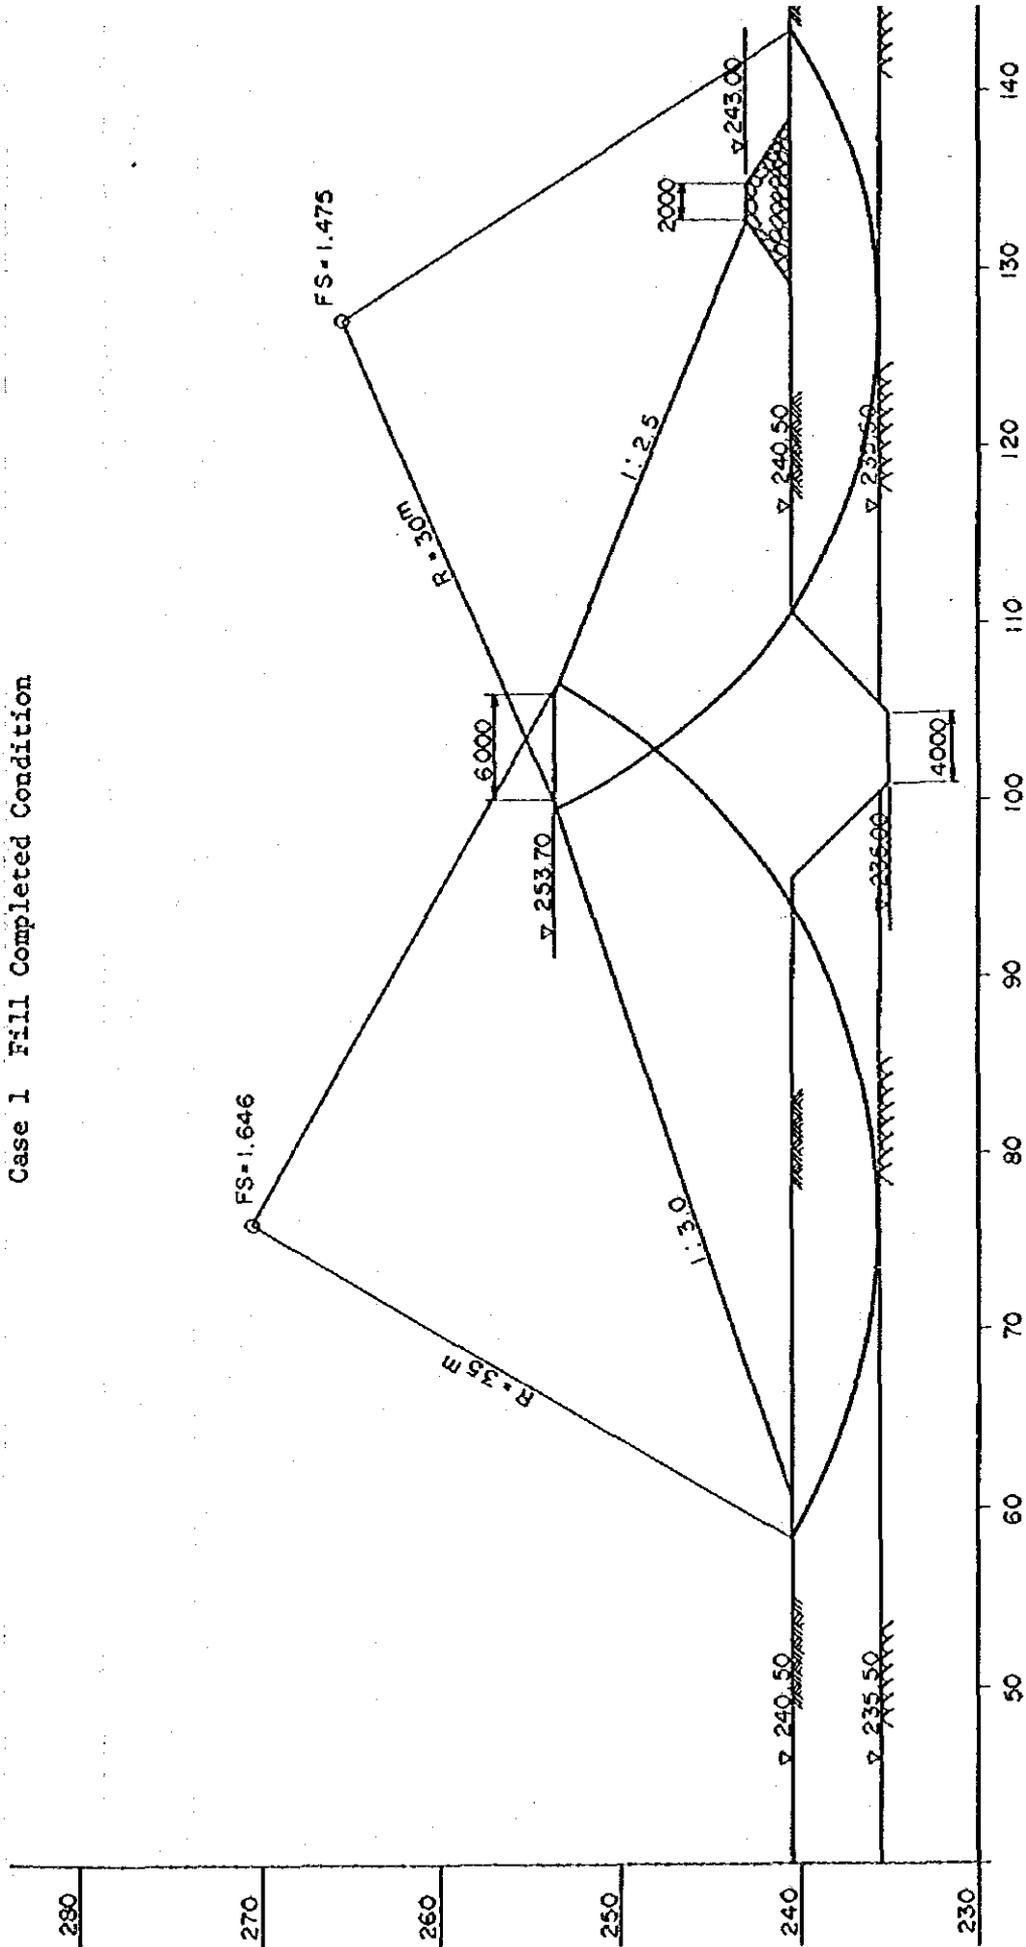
Slope Stability Analysis (Meh Kah Dam)
